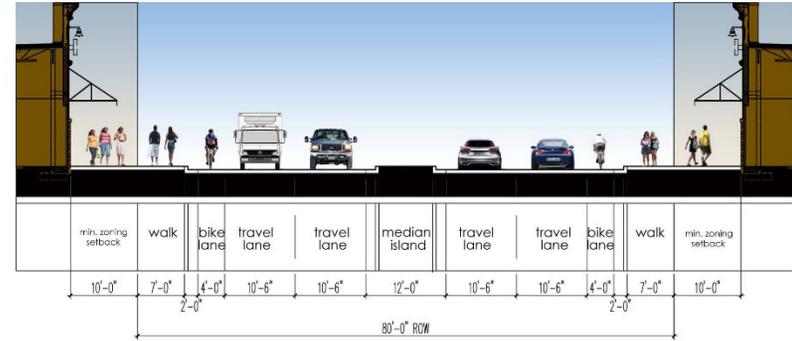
Segment 3 (Nova Road to Ridgewood Avenue)
